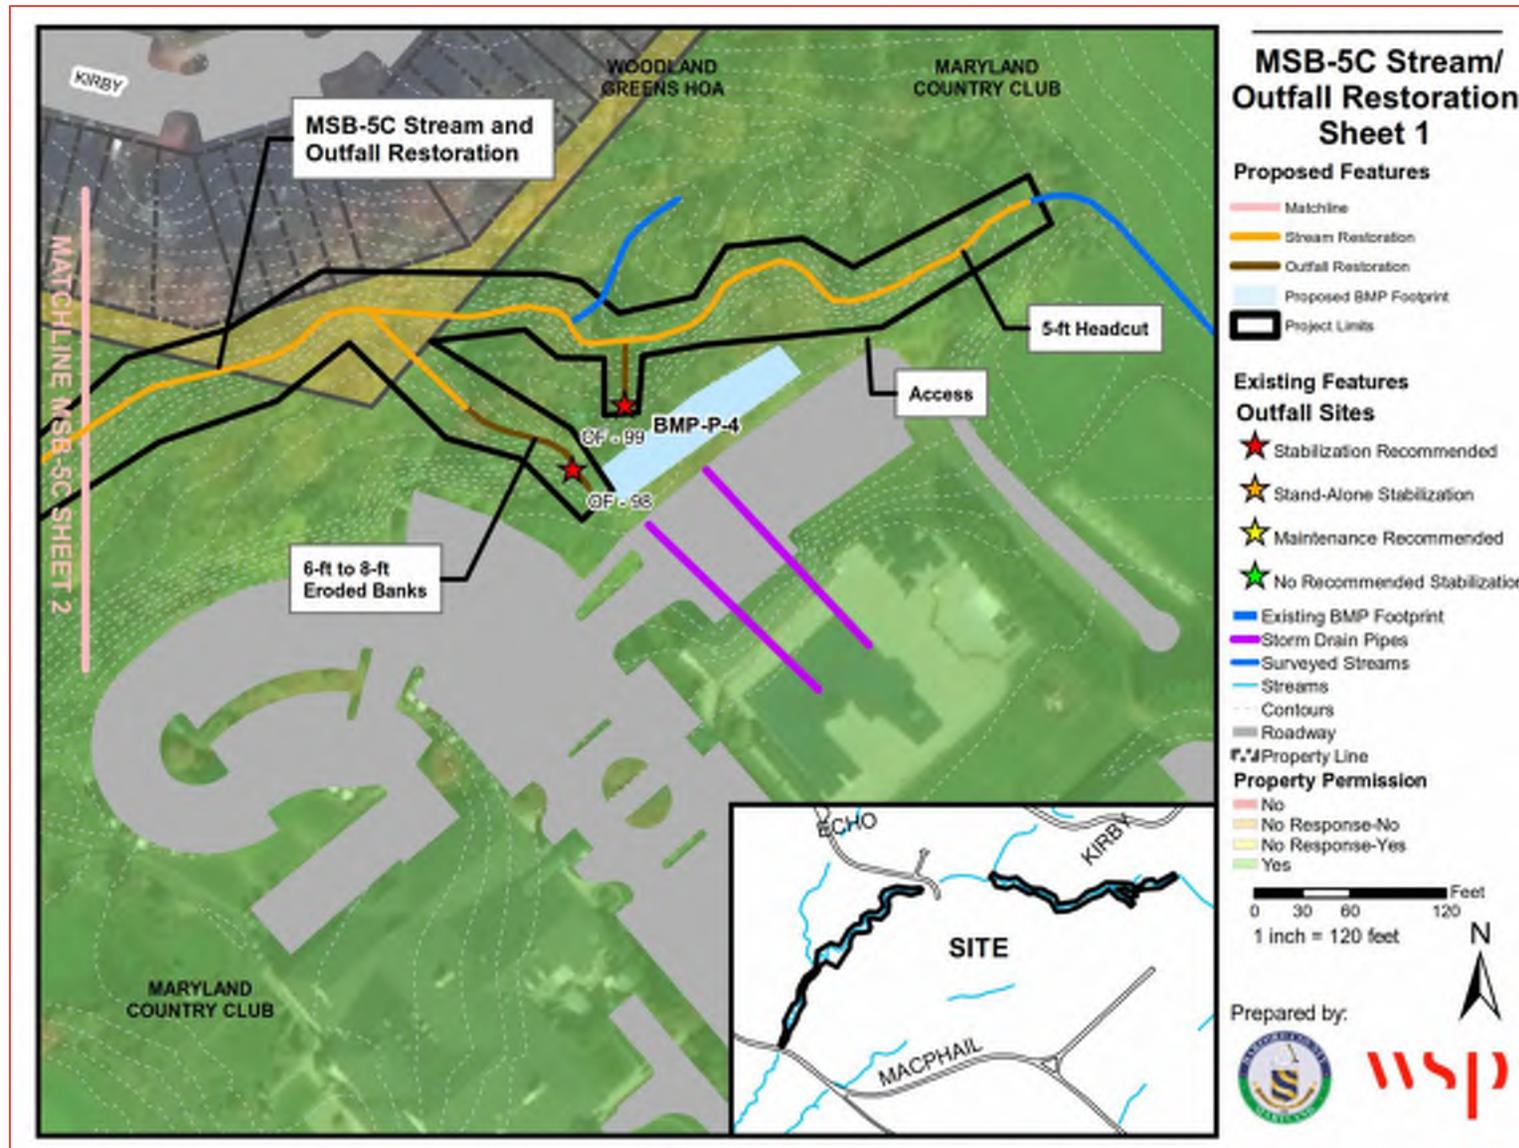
Site Location and Proposed Project Plan for MSB-5C Stream and Outfall Restoration (Sheet 1 of 5)
